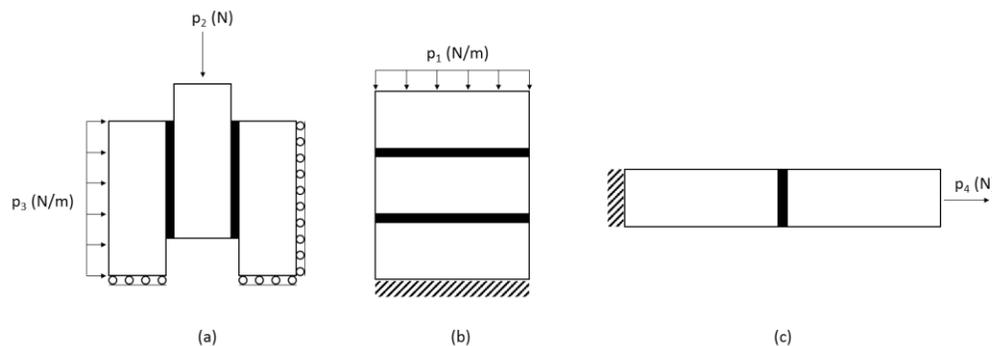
(a) Triplet test (b) Compression test (b) Standard tensile test
